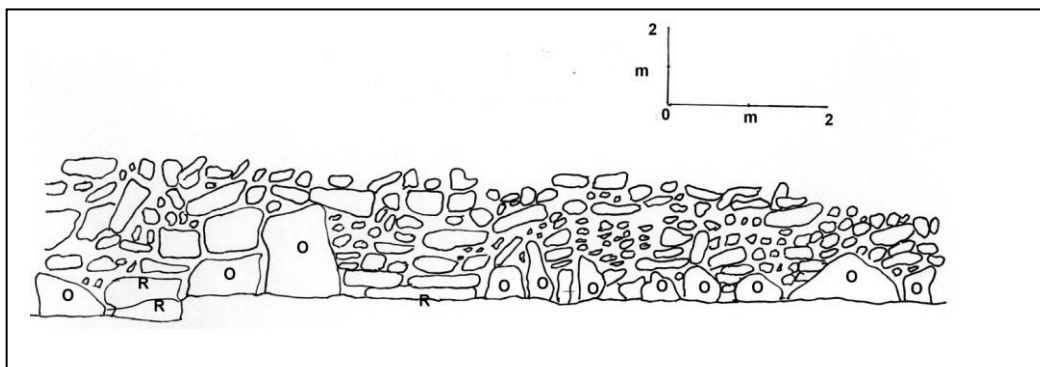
A 12m-long profile of the north end of Wall no. 25
